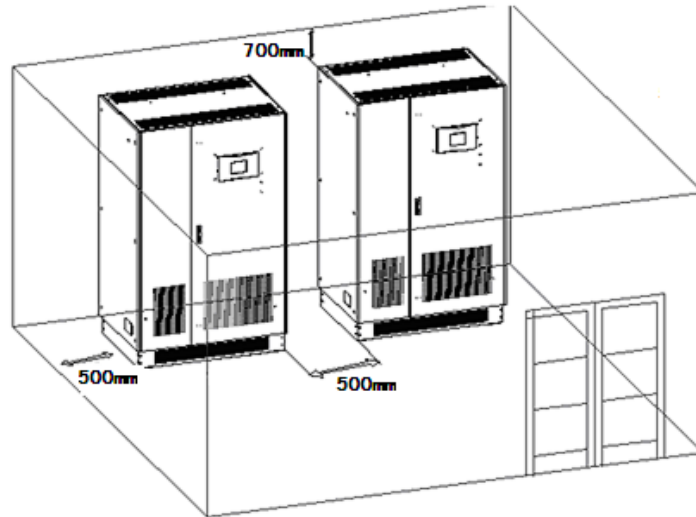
installation space diagram of 160~300KVA UPS (unit: mm)
